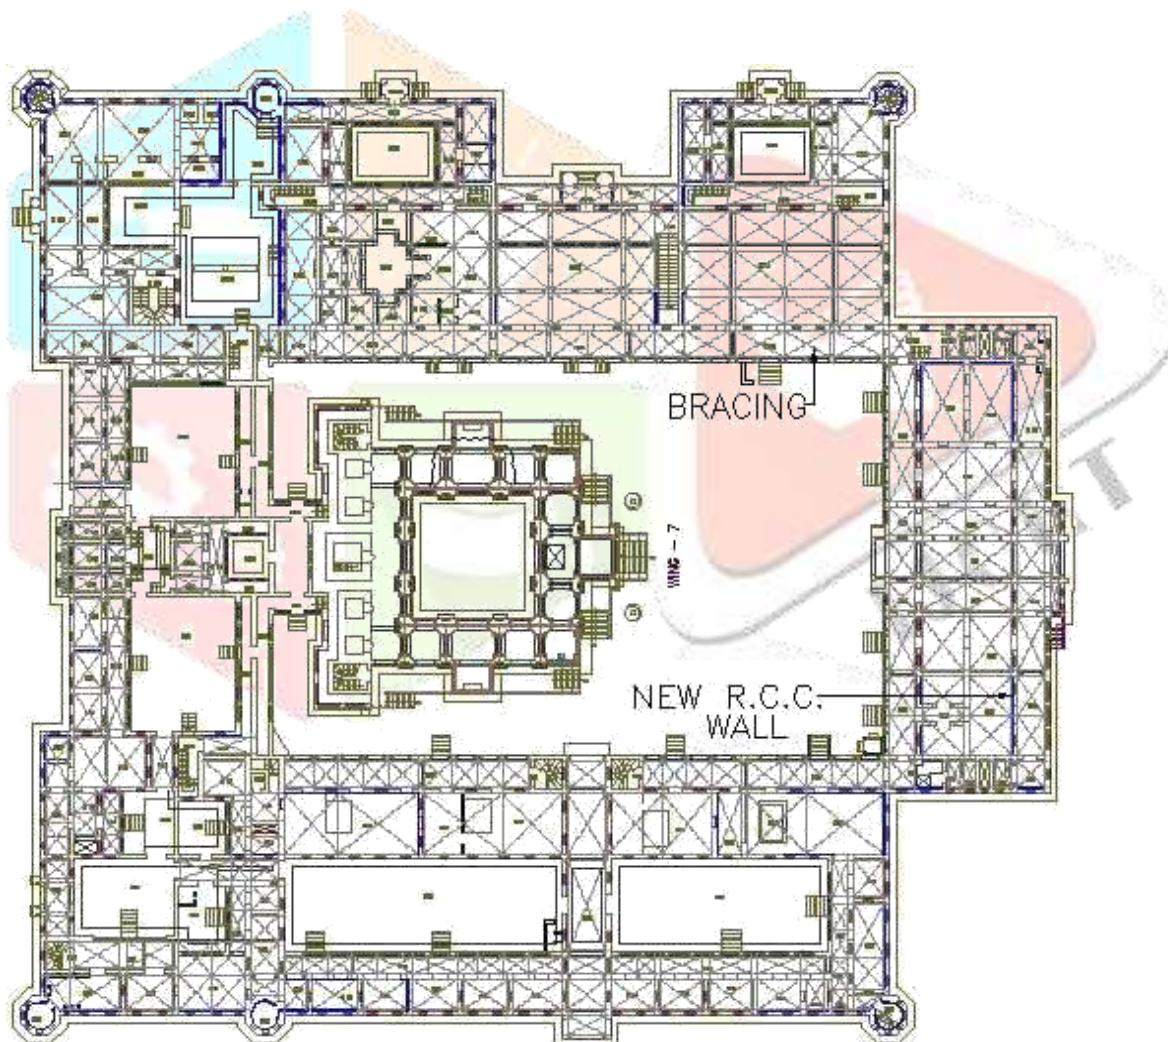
Location of Proposed Bracings and R.C. Skin Walls at First Floor Level.
